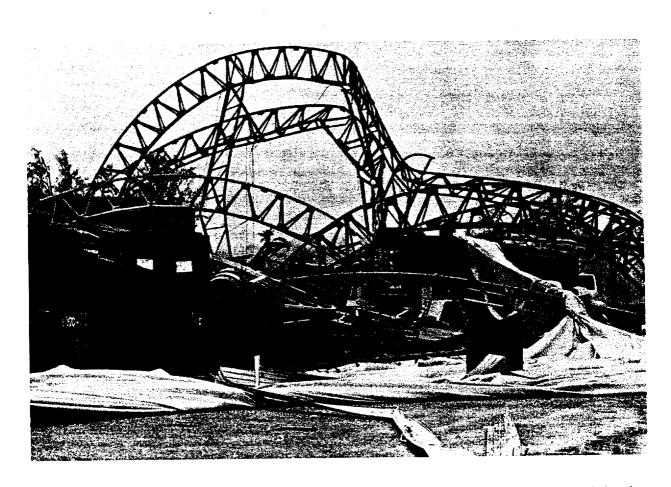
The steel girders of this temporary warehouse on Naval Station, Guam were twisted by the high winds and collapsed during Russ' passage.
